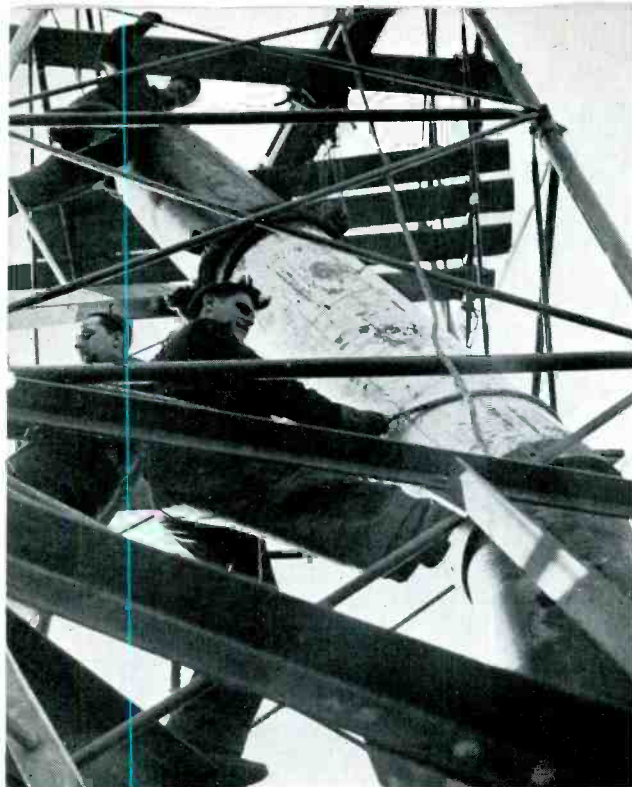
, LEFT: WITH THE BOTTOM SECTION IN PLACE, THE SECOND SECTION WAS LOWERED INTO PLACE AND WELDED TO THE FIRST. THE PIPE SCAFFOLDING WAS USED TO SUPPORT THE SECTIONS UNTIL THEY WERE WELDED. FIG. 7, RIGHT: LOOKING UP THE MAST AFTER COMPLETION
